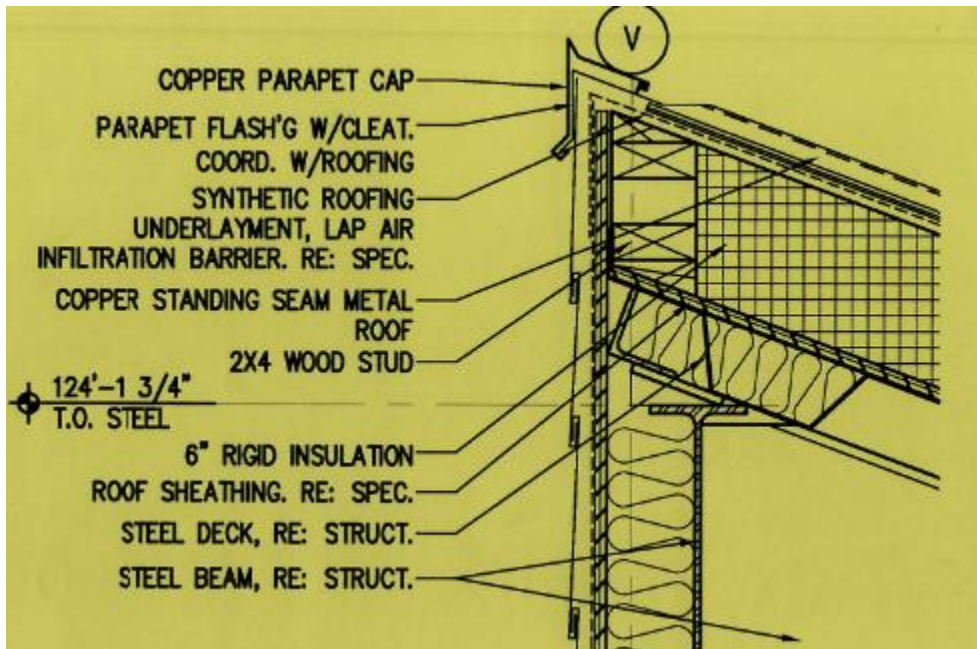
Original CDs, Detail 6, Sheet 9.2, Section through copper standing seam roof system
